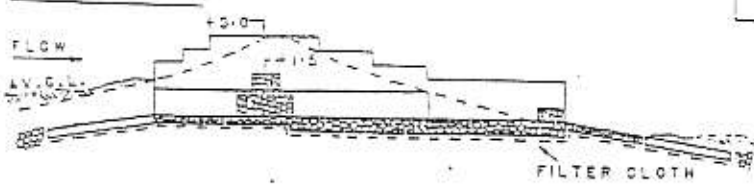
Typical Improvements Proposed for Traditional Spate Canal Intake
